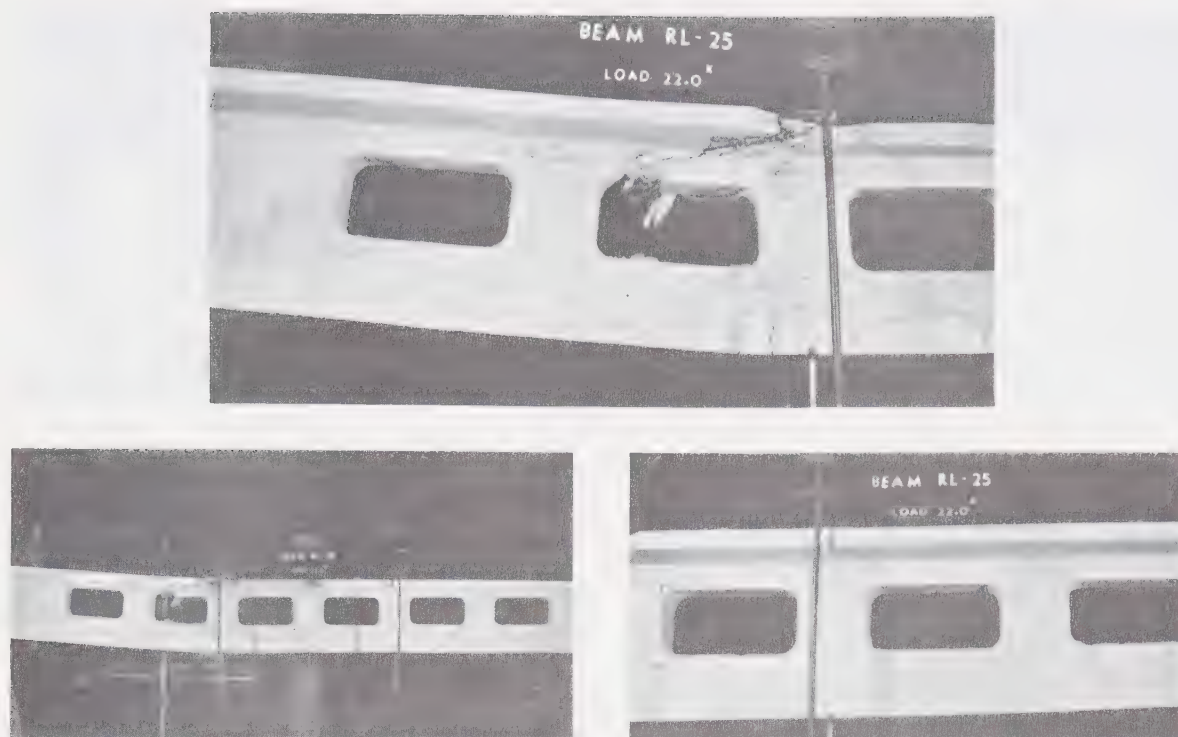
CRACKING AND FAILURE PATTERN OF BEAM 25-16-6
